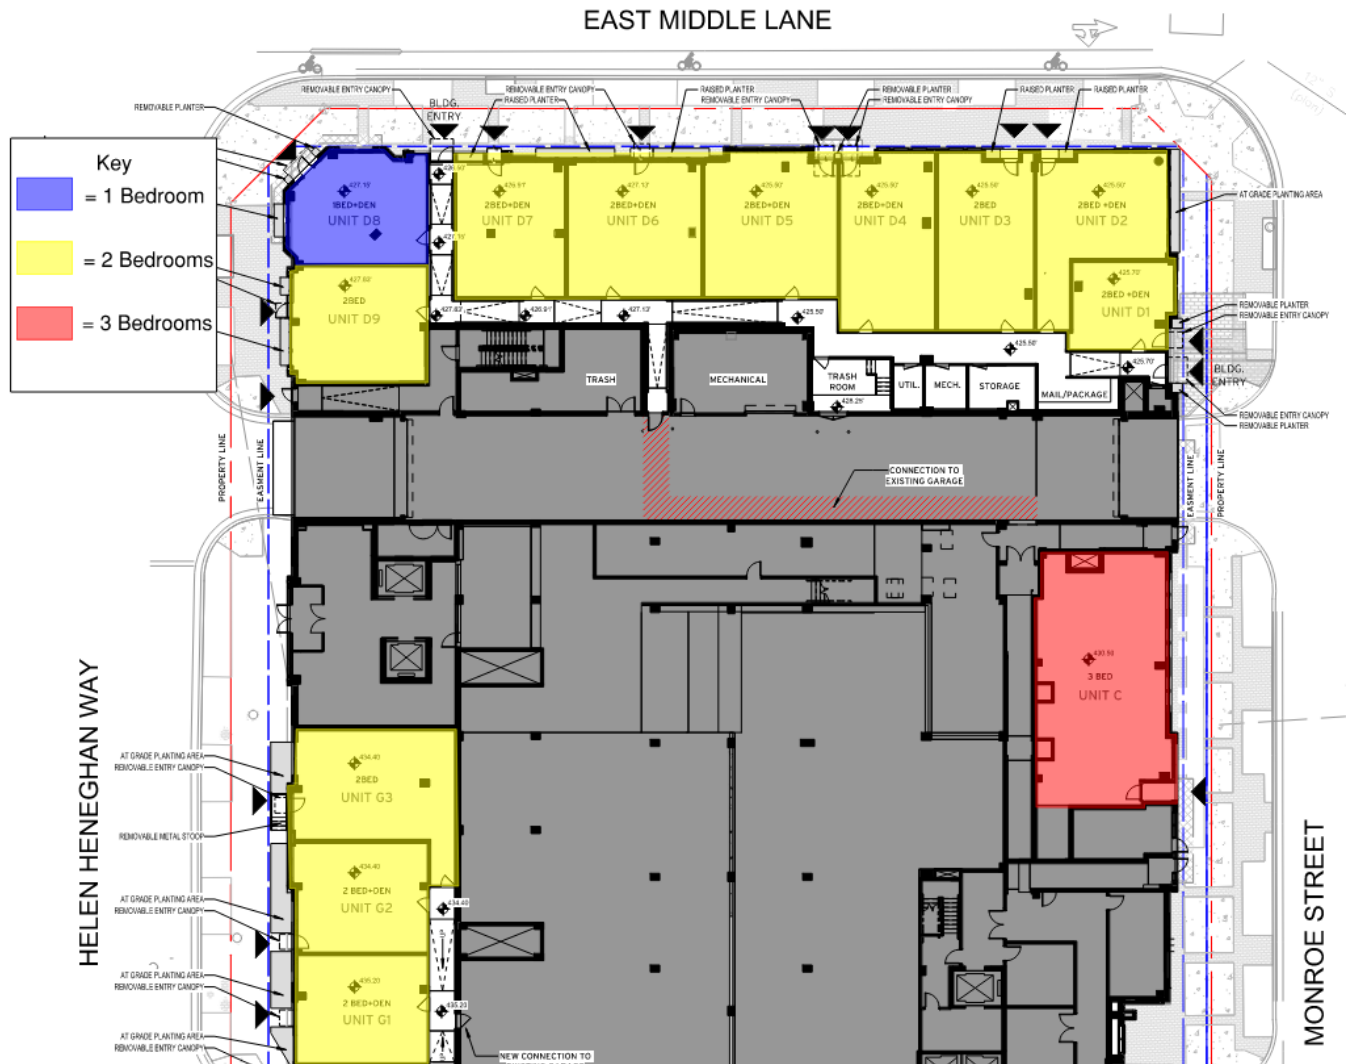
Site/interior floor plan depicting the proposed unit bedroom types. (Plan provided by applicant, markup by staff)
